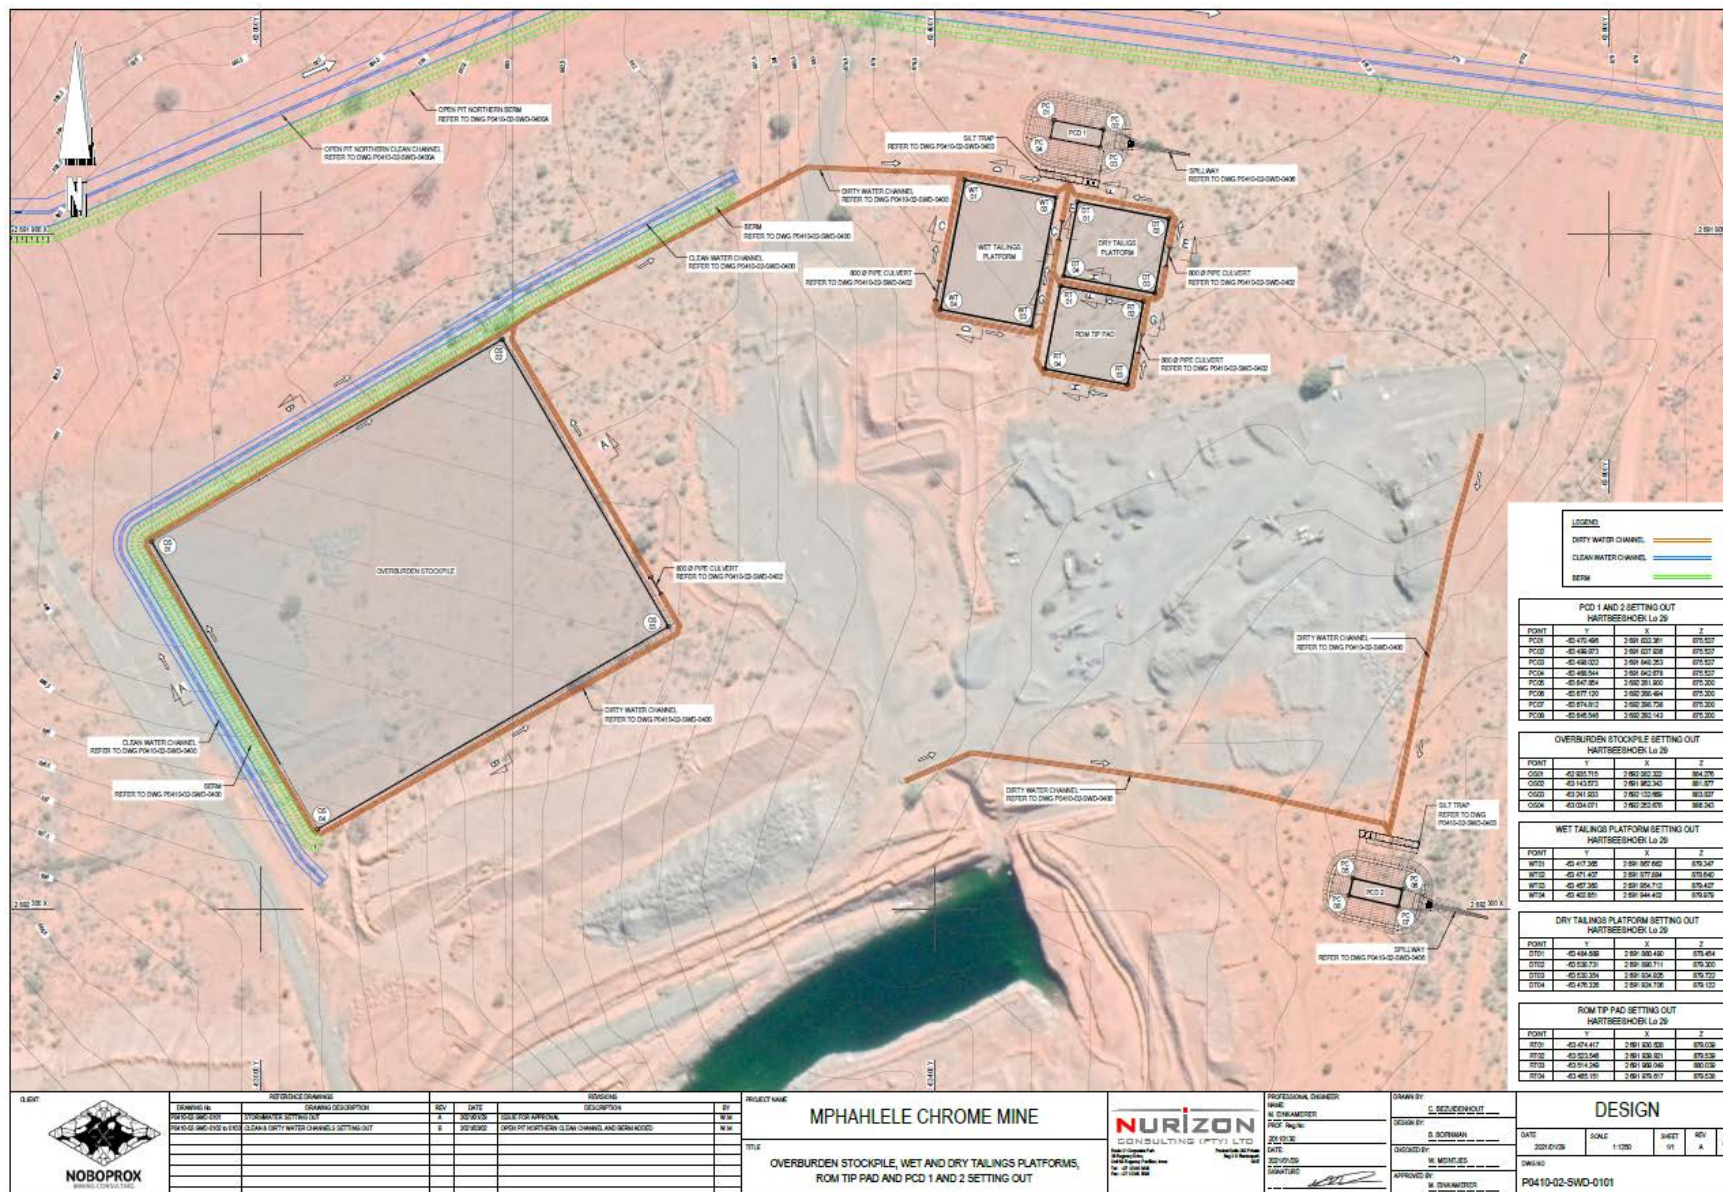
Plant and residue stockpile layout (refer to Appendix 4)
